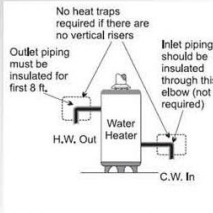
F—Heat Traps on a Tank with Connections on Sides
